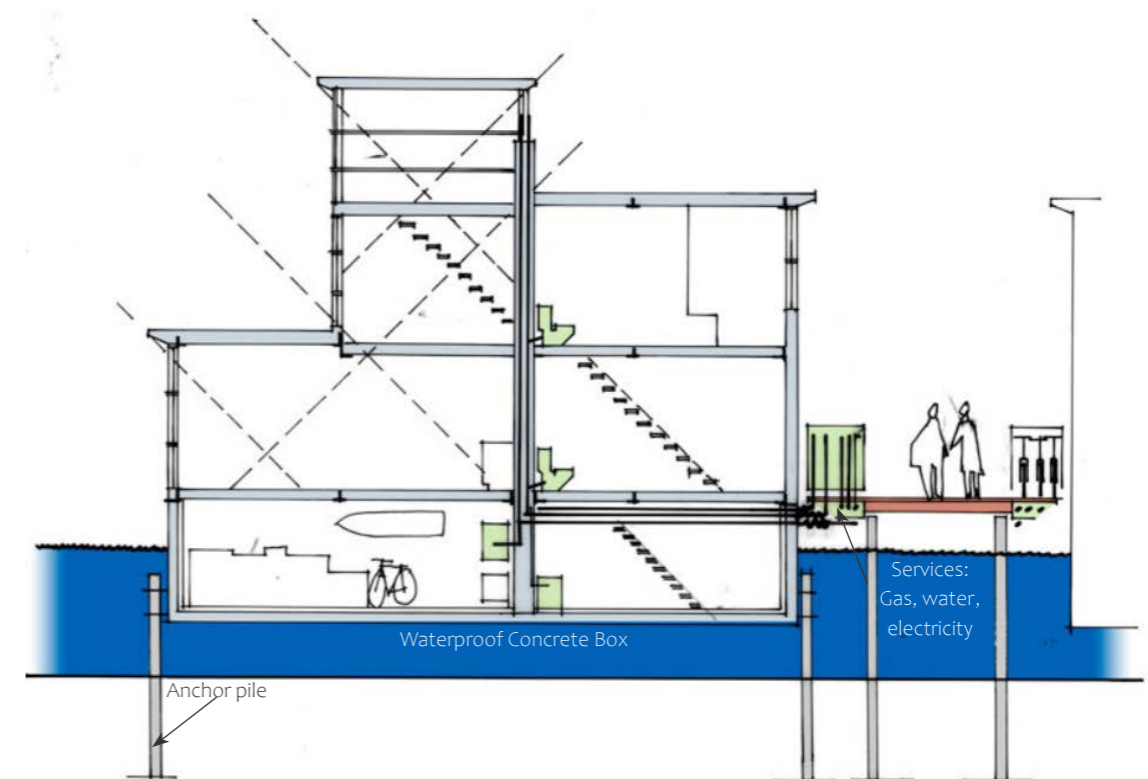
Concrete caissons support the house and are fixed to piles that allow some movement of the shell (Rubin. S,2021)
